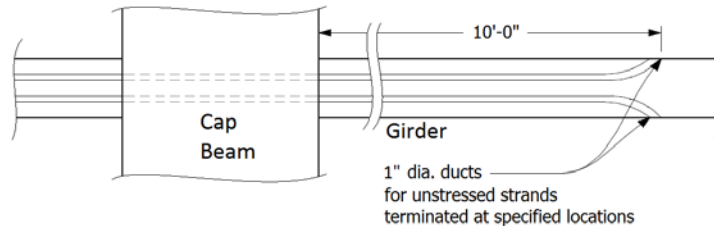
Grouted unstressed strand connection (GUSC) detail
